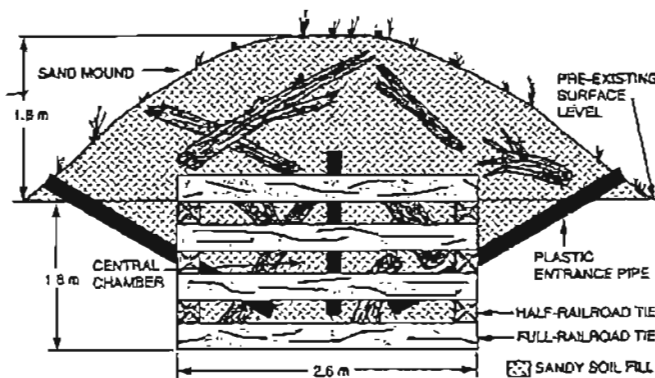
Structural design of underground refugia. Refer to adjacent text for construction details.
